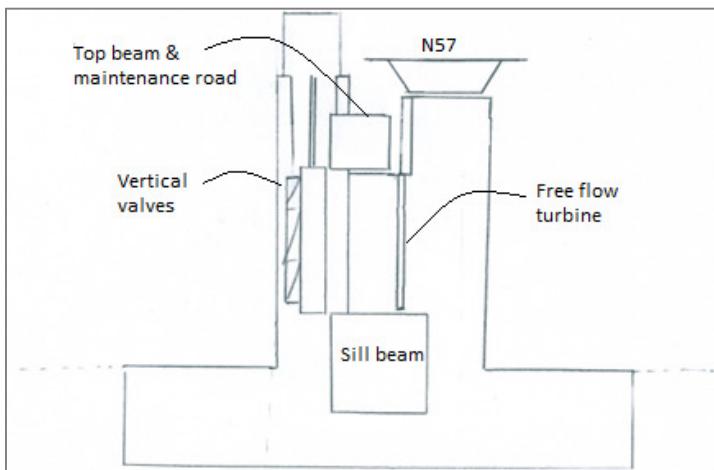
Variant 2A/2B Cross-section of 'Eastern Scheldt barrier' like structure
